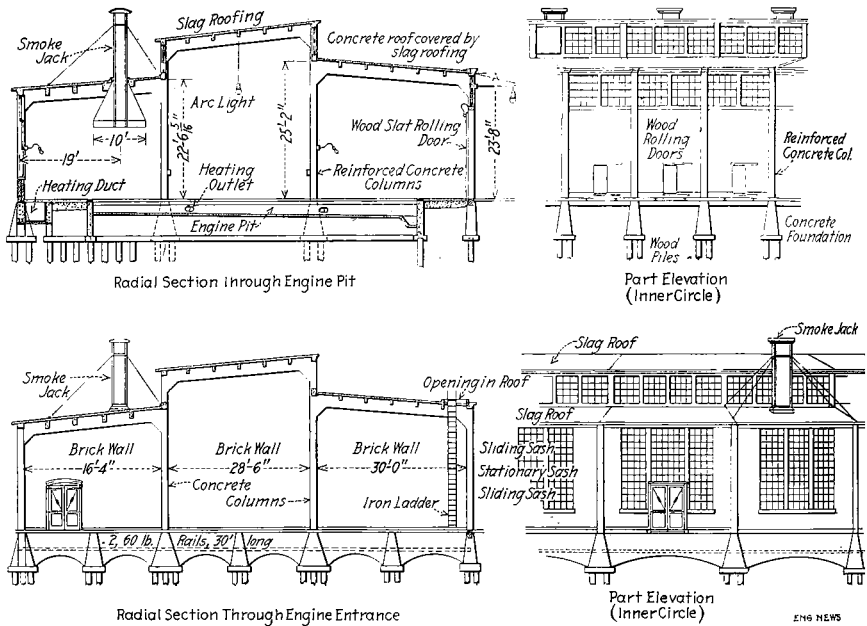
SECTIONAL ELEVATION OF ENGINE HOUSE.
